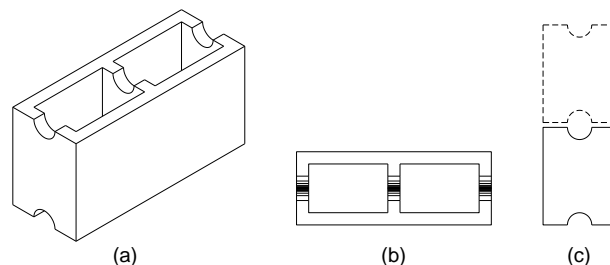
Masonry block, (a) two vertical holes, (b) half reeds for horizontal ducts and (c) forming a masonry wall
